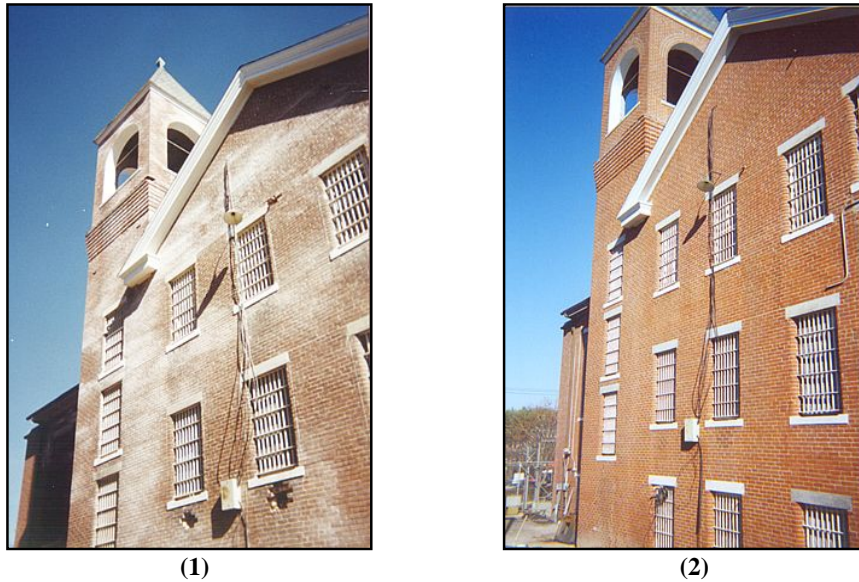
A masonry facade before (1) and after (2) a repointing application
